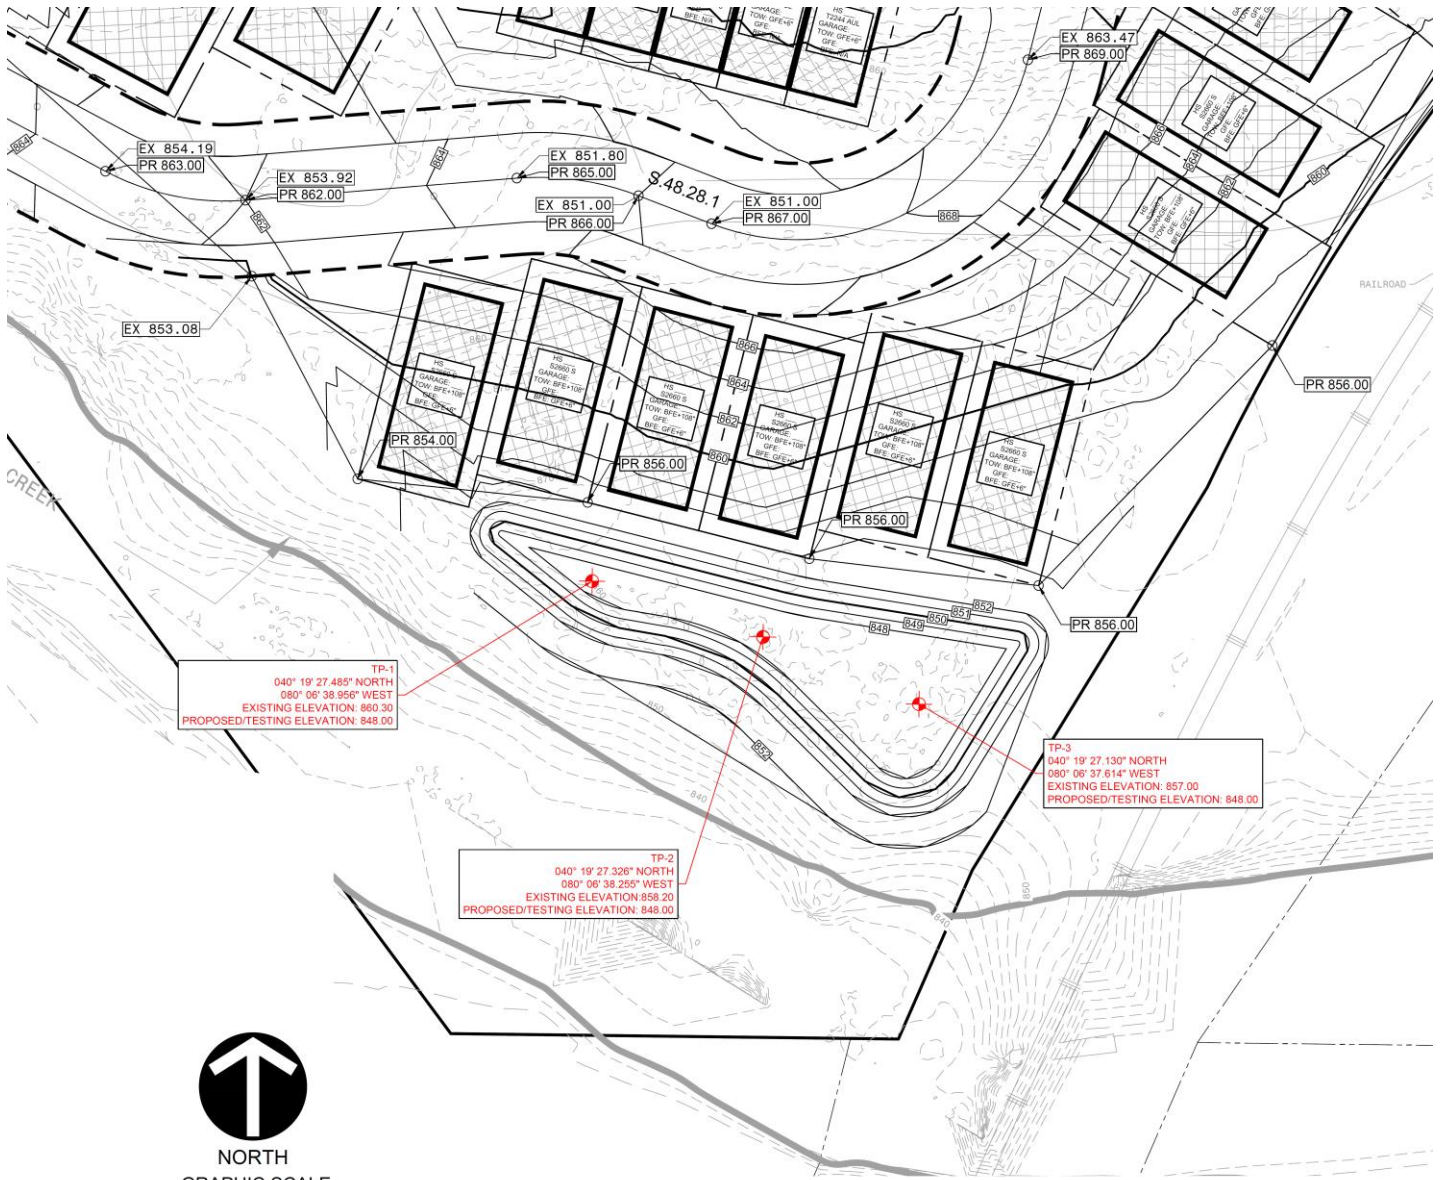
Infiltration Testing Plan – Phase 1.9.3 / 1.9.4 Area
